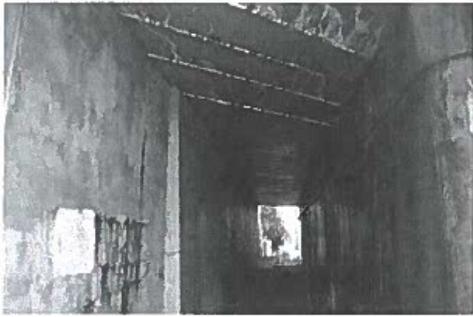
View looking South through Span 3 of the Saratoga Street Bridge (photo taken from Bridge Inspection Report, dated March 8, 2017)
